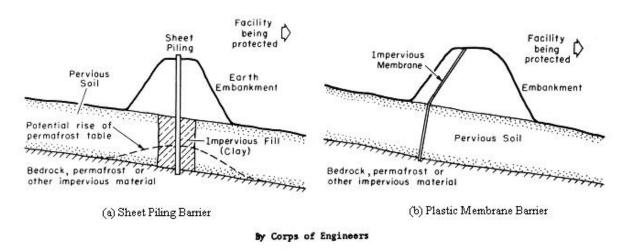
Typical Cross Section of a Frost Belt Installation
